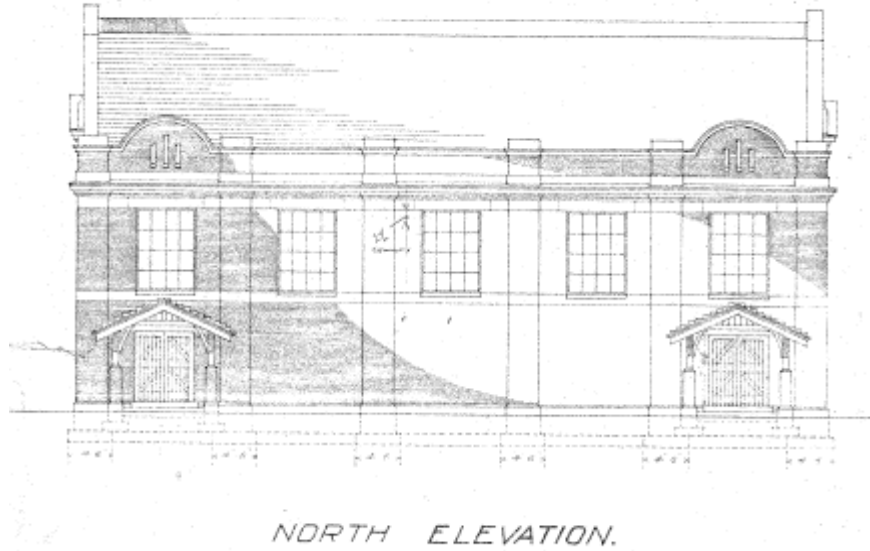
North elevation, Princes Bridge Lecture Room, dated 1914. (Source: PTV Drawing Management System)
